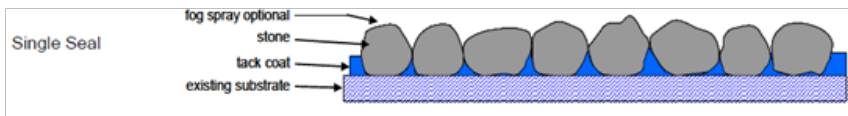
Single-layer chip sealed road pavement cross-section (SANRAL 2007)
